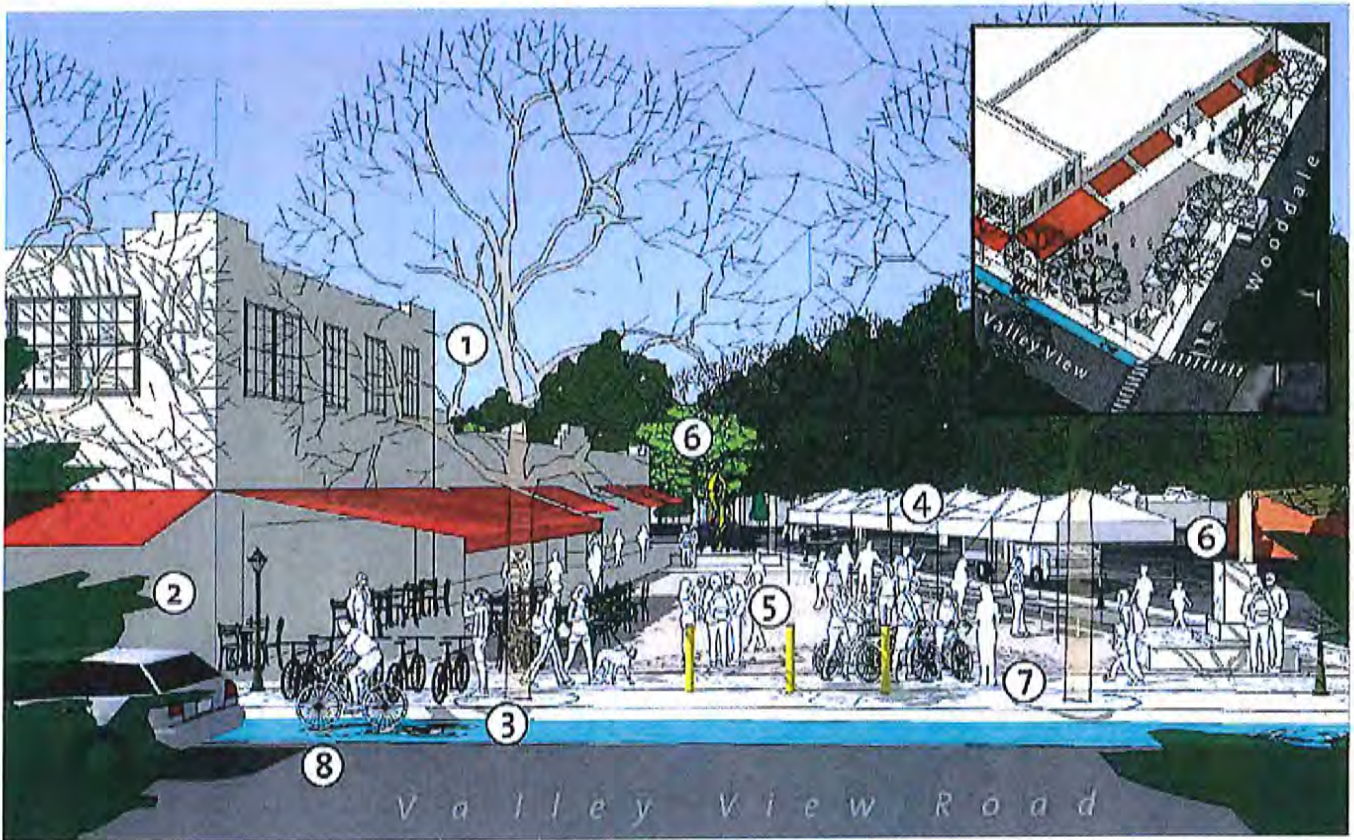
Concept Illustrating Gathering Space Guidelines at the Northwest Corner of Wooddale Avenue and Valley View Road
